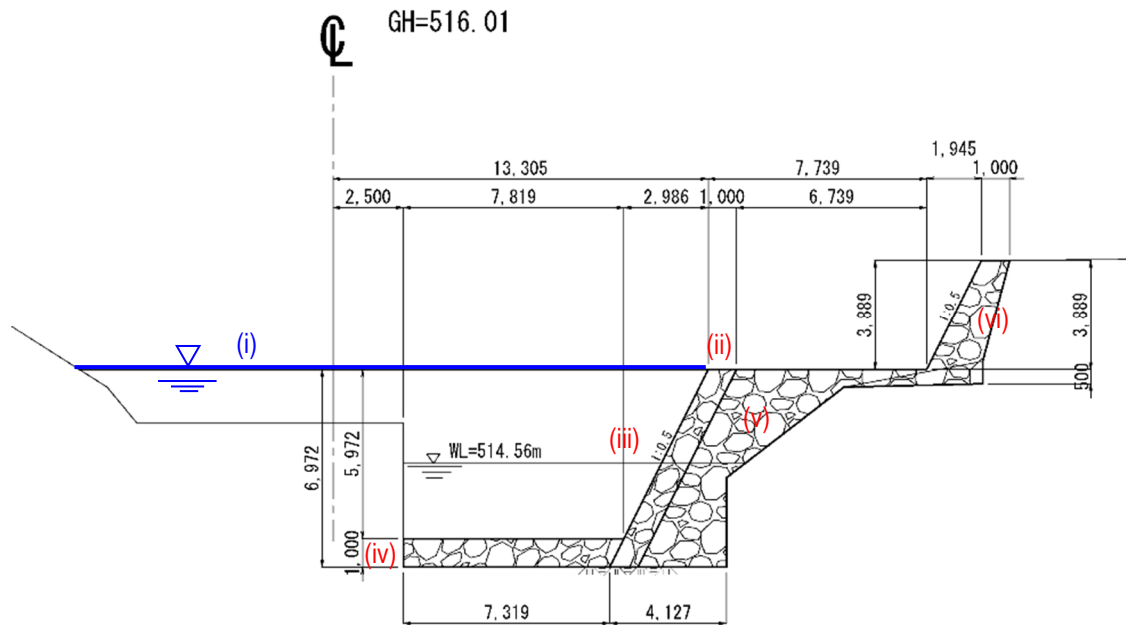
Scale of Emergency Repairing Measures for Two Large Scale Collapses on the Right Bank Side Wall of the Connection Canal
